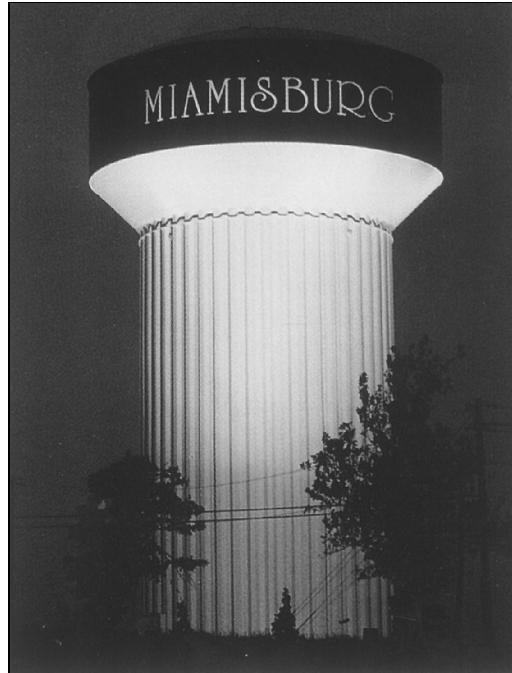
Folded-plate design of a modified single-pedestal tank support
